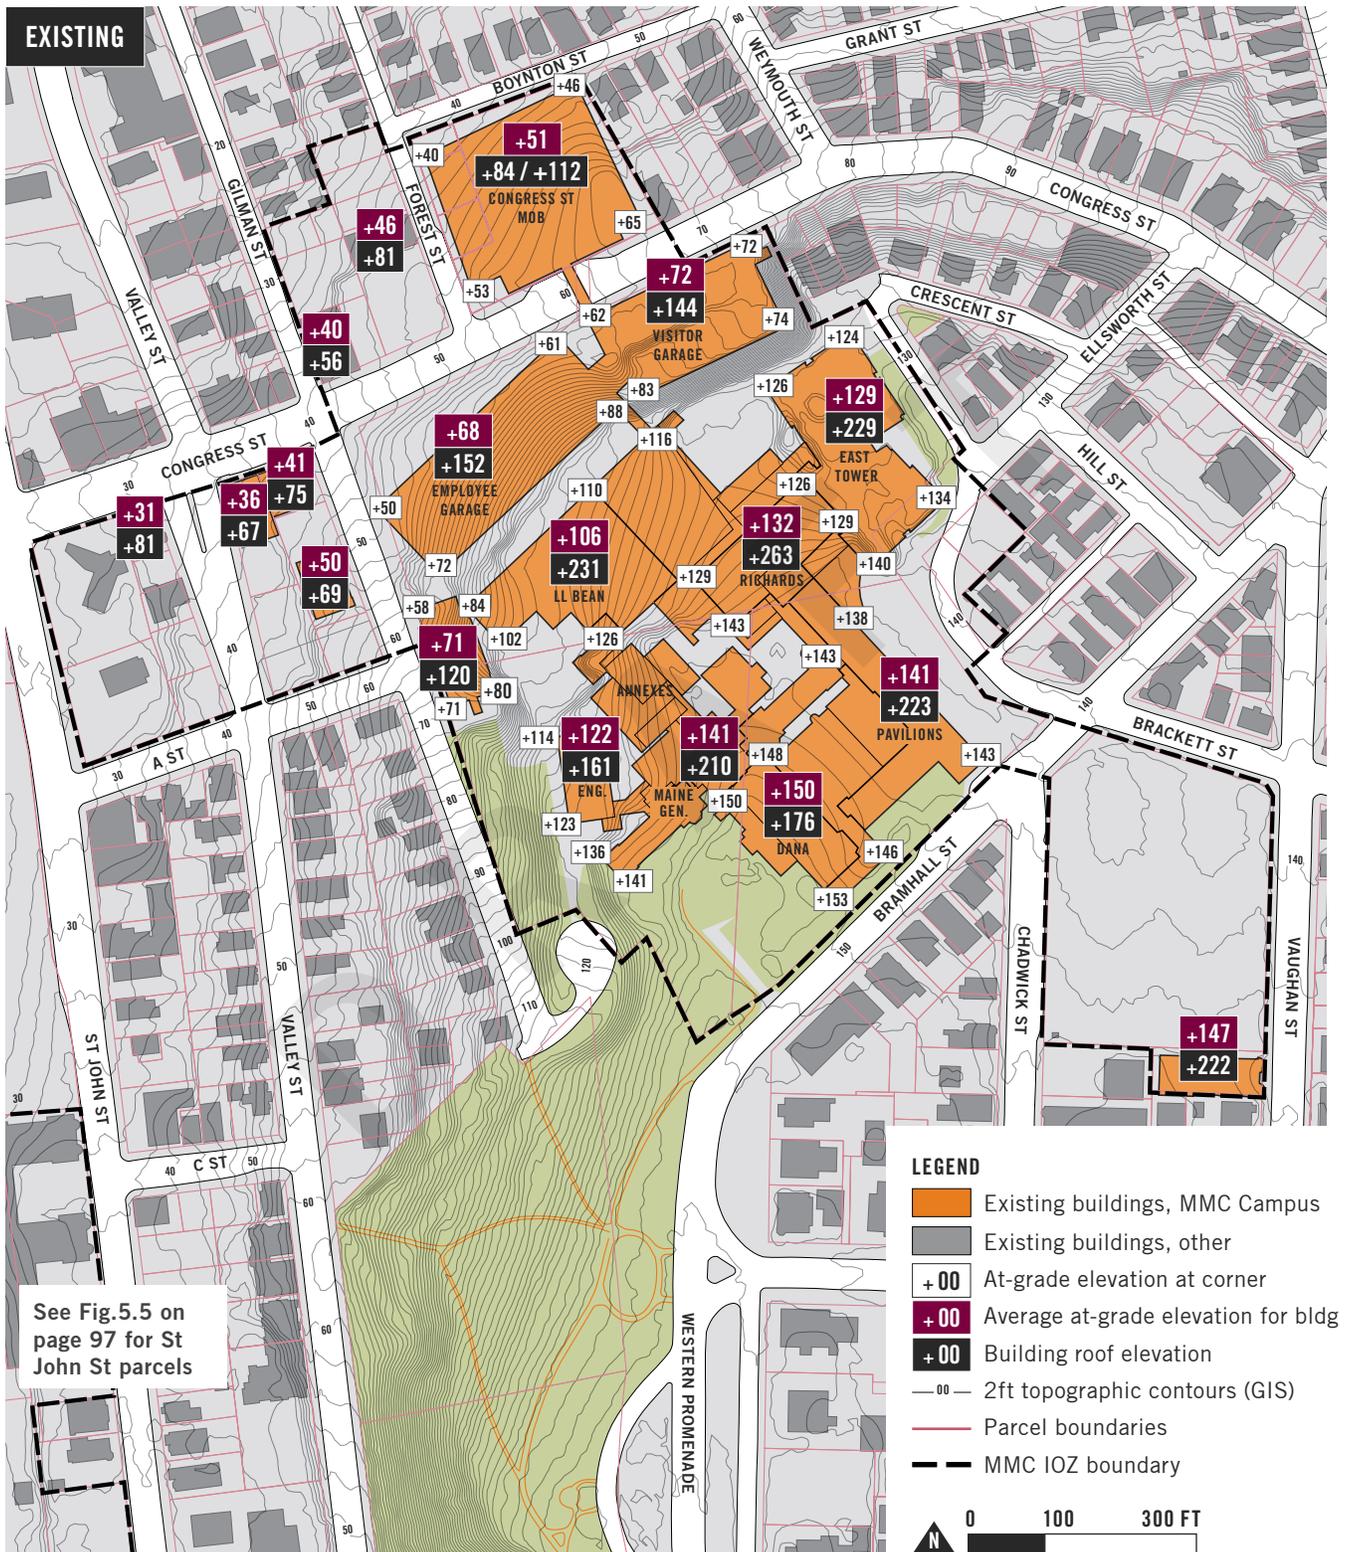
MMC Long-Term Development Vision: At-Grade and Rooftop Elevations
